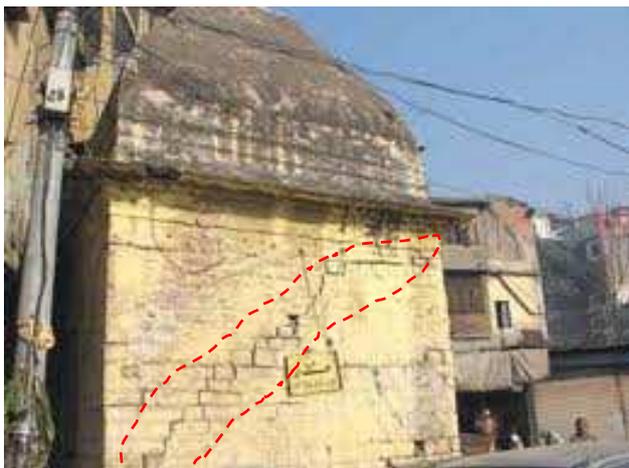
Diagonal cracking in the Masonry wall of an Olden Temple
